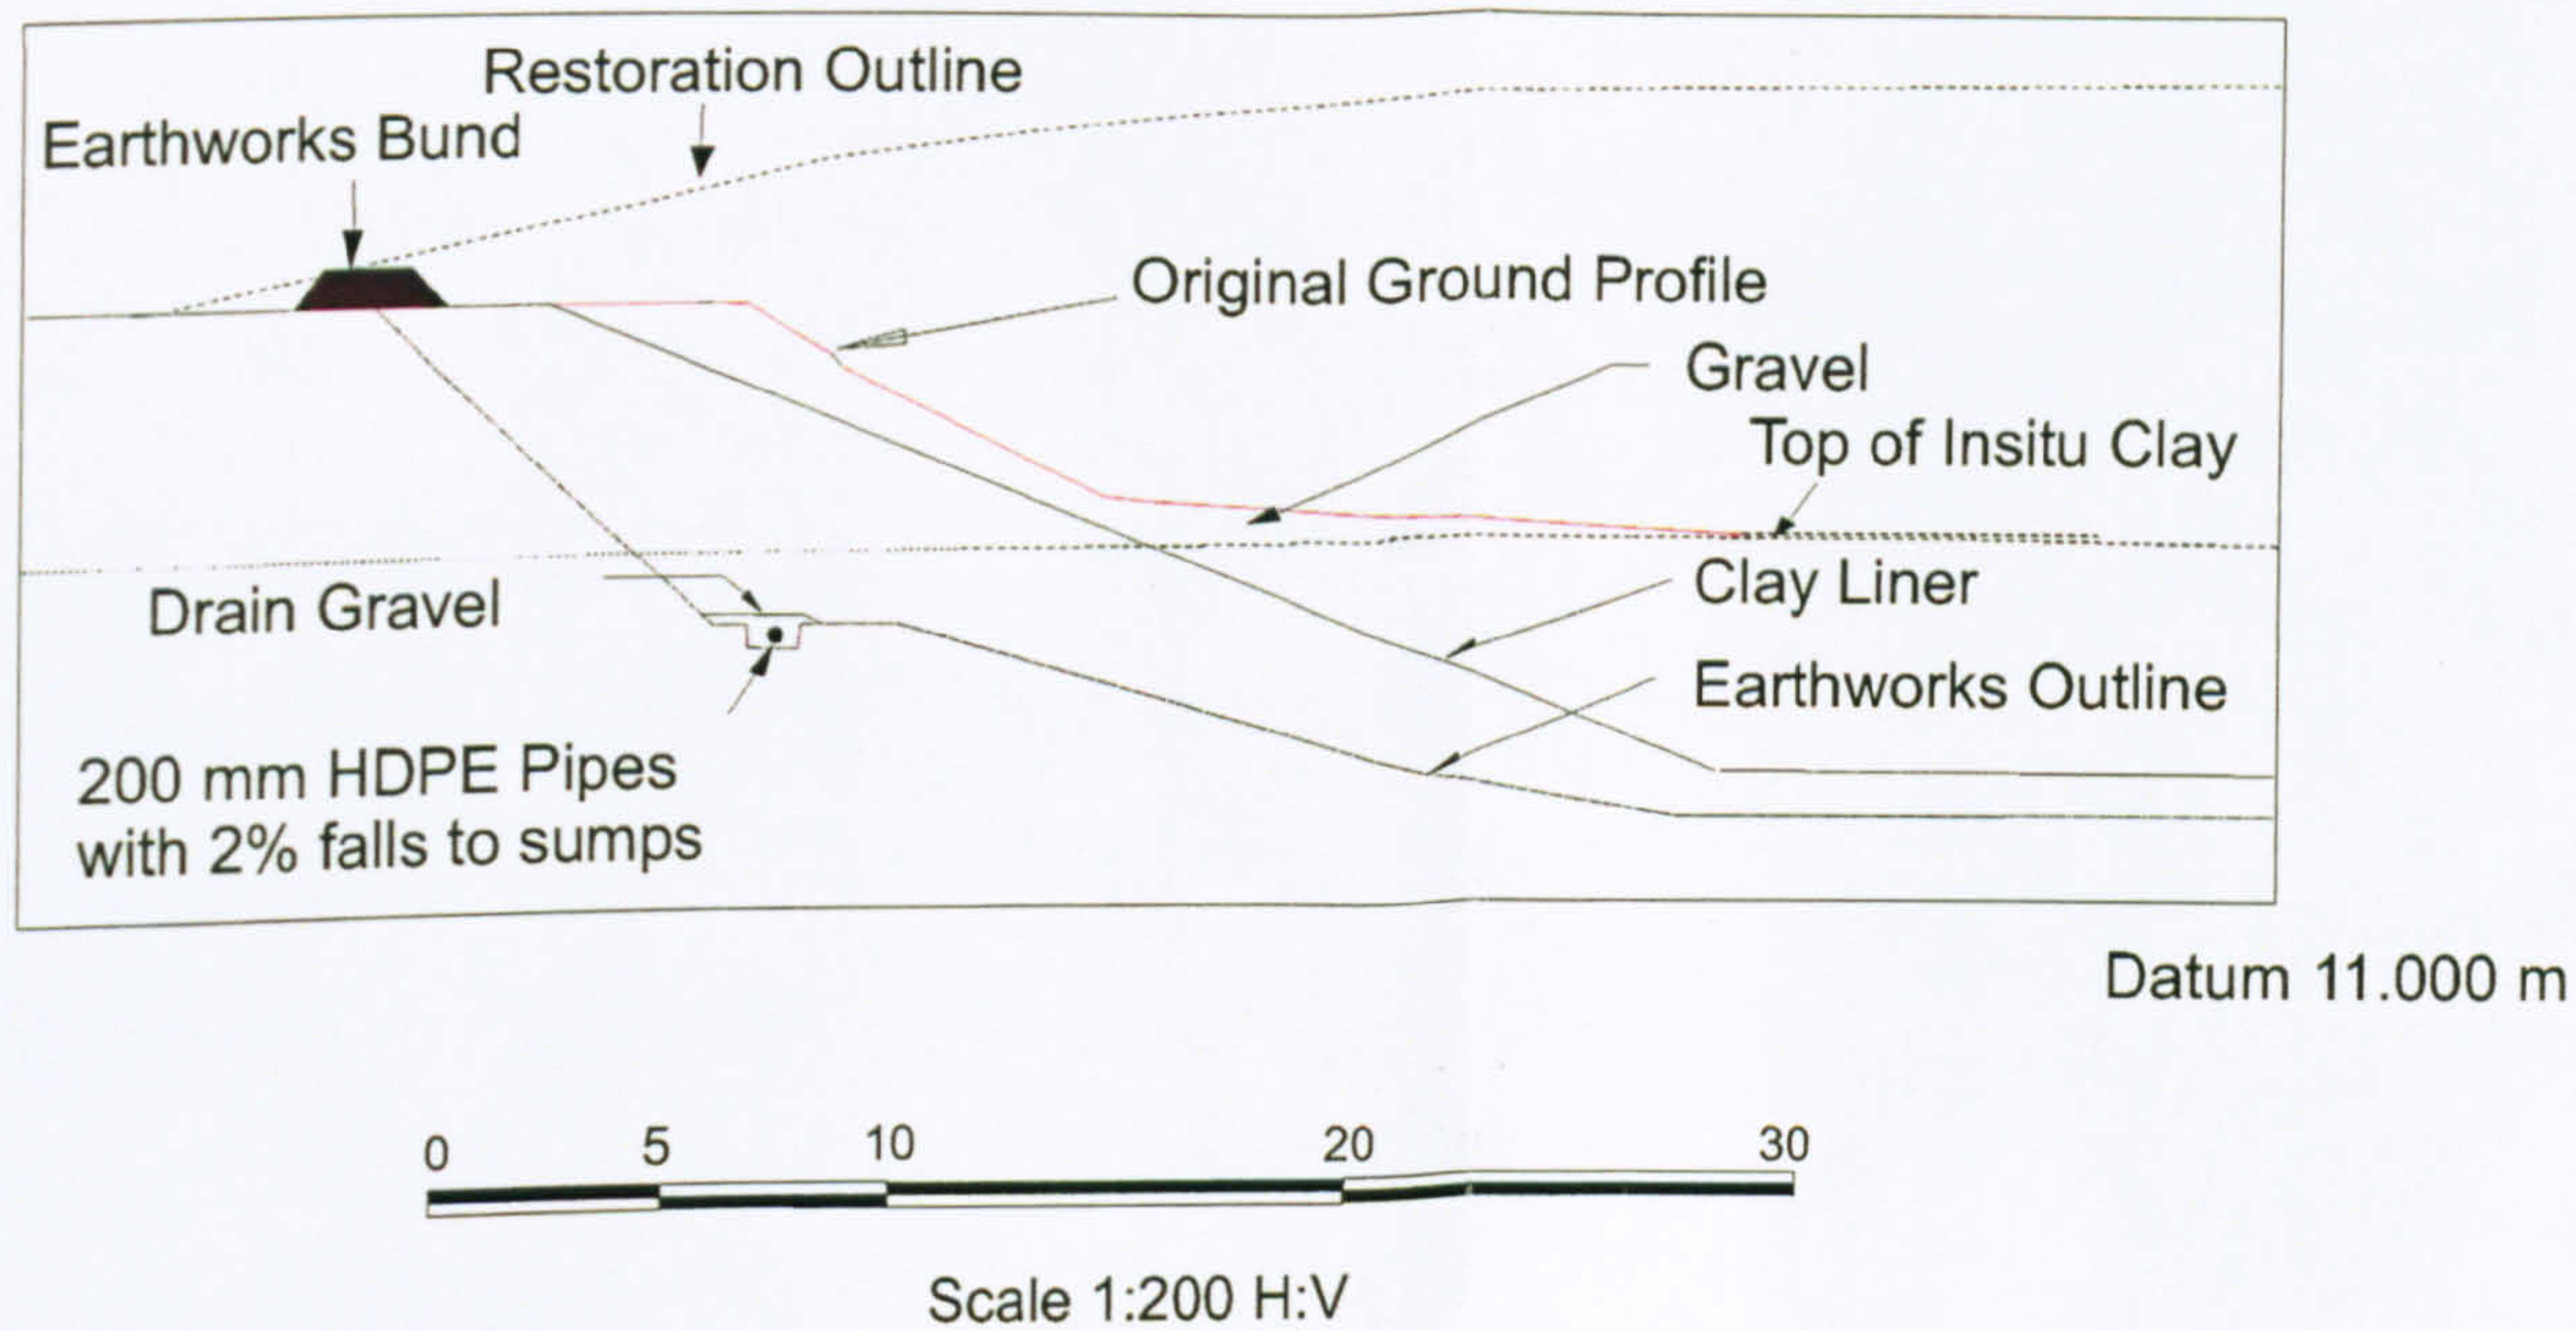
Details of the Liner and the Riser Connections at Site Alpha
